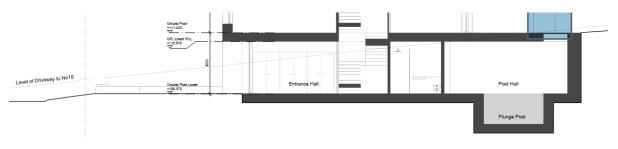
Cross-section of proposed works at 18A Frognal Gardens
